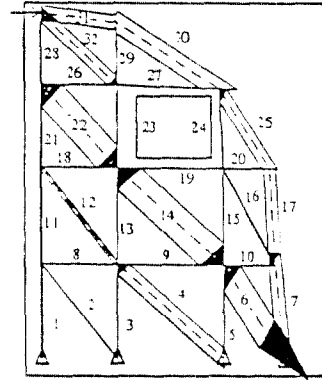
Dimensioned Strut-Tie Model for the Shear Wall
